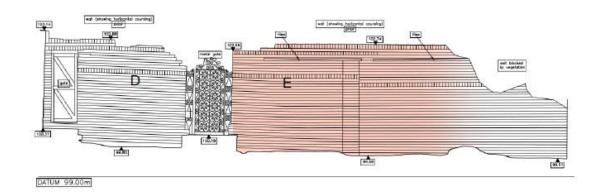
South end of the boundary wall as viewed from No. 22 Frognal Way. (Structurally unstable sections of the wall highlighted in red)
